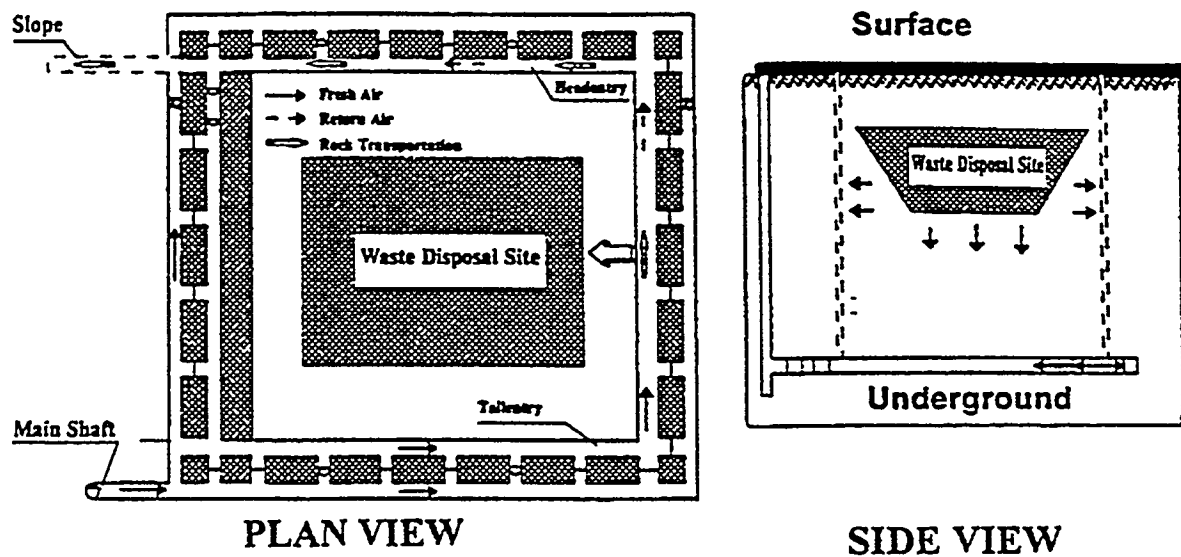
Conventional longwall development illustrating the vertical shafts and development tunnels.
